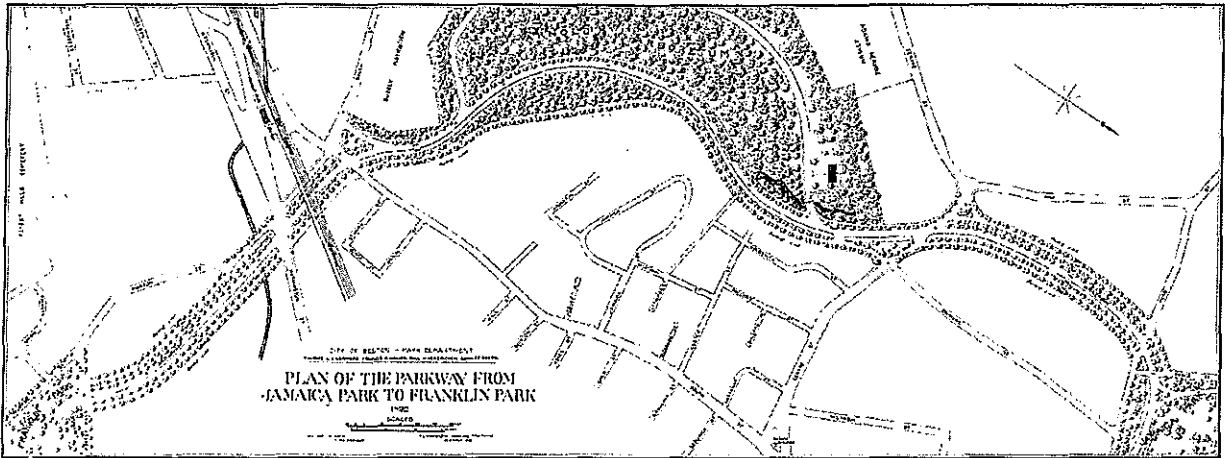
Plan of the Parkway from Jamaica Park to Franklin Park, December 1892
